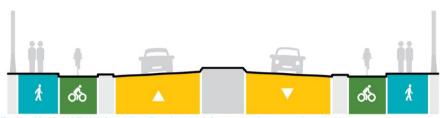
NOR W4 Spedding Road typical Cross section – two lane bridge
